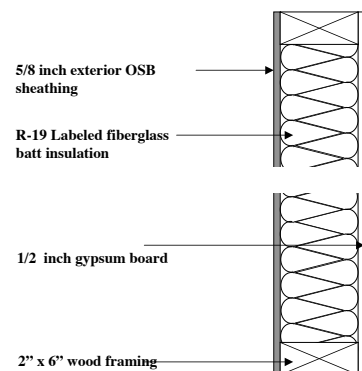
The 2” x 6” wood framed wall was insulated with “R-19” labeled fiberglass batts and enclosed with 5/8 inch exterior OSB sheathing and 1/2 inch gypsum board.
